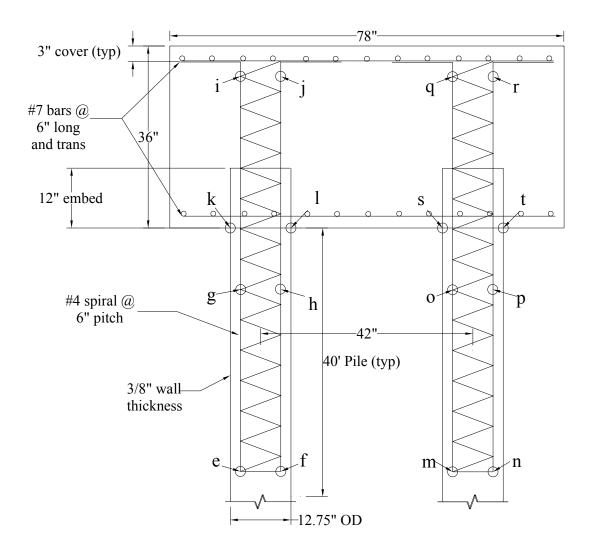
Pile Cap 2 with construction details and instrumentation layout.
